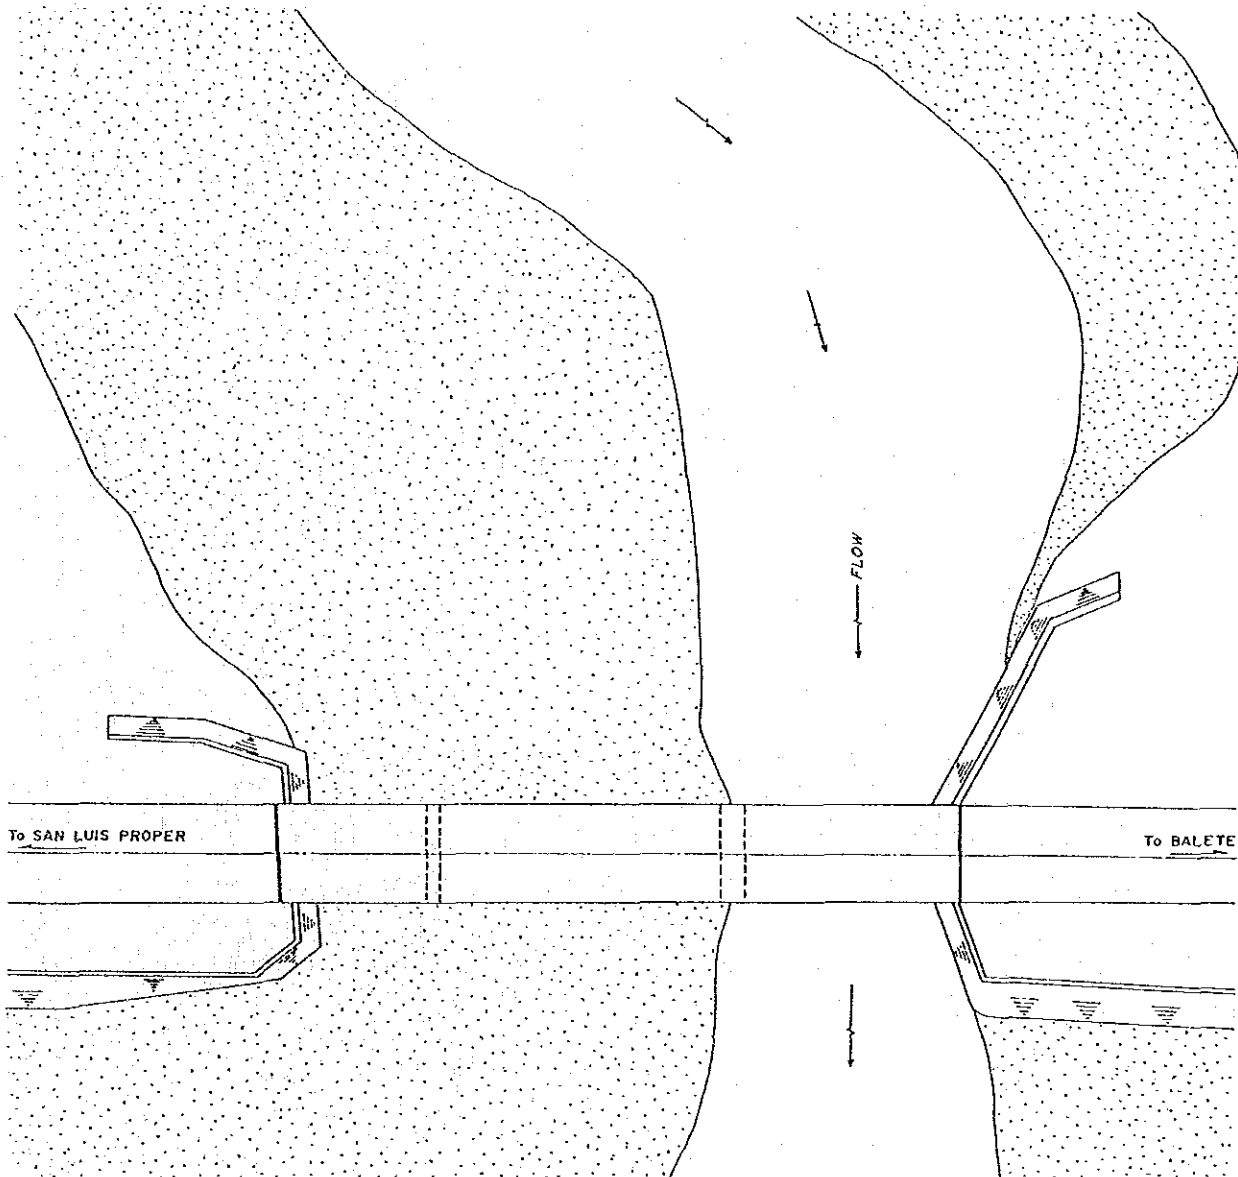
PLAN OF BANOYO RIVER (BS-50)
